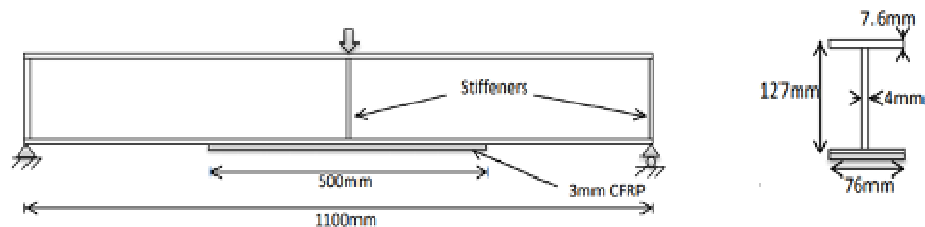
Details of tested Specimen S305 (Deng and lee 2007)
